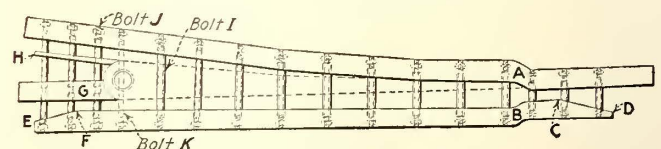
CONSTRUCTION OF COMPLETE SWITCH
